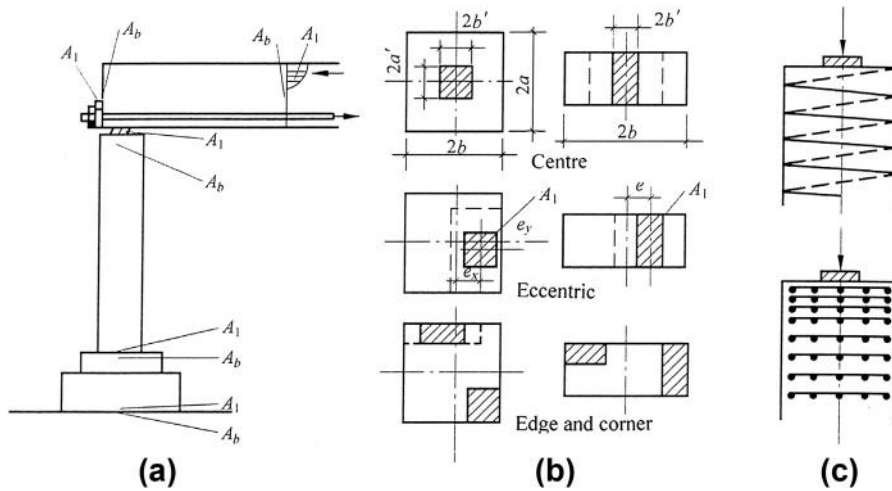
Situations of local compression: (a) engineering example, (b) positions of compressed area, (c) local reinforcement
